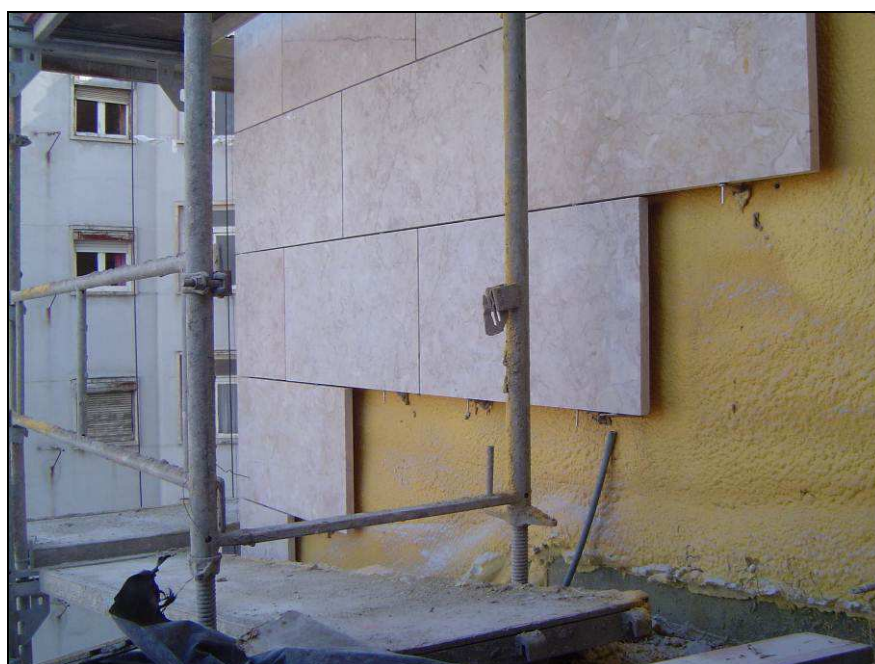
Ventilated rainscreen façade which comprises a cladding made of natural stone (mechanically fastened to the wall structure through metallic elements) and a layer of insulation material partially filling the cavity (projected PUR)
